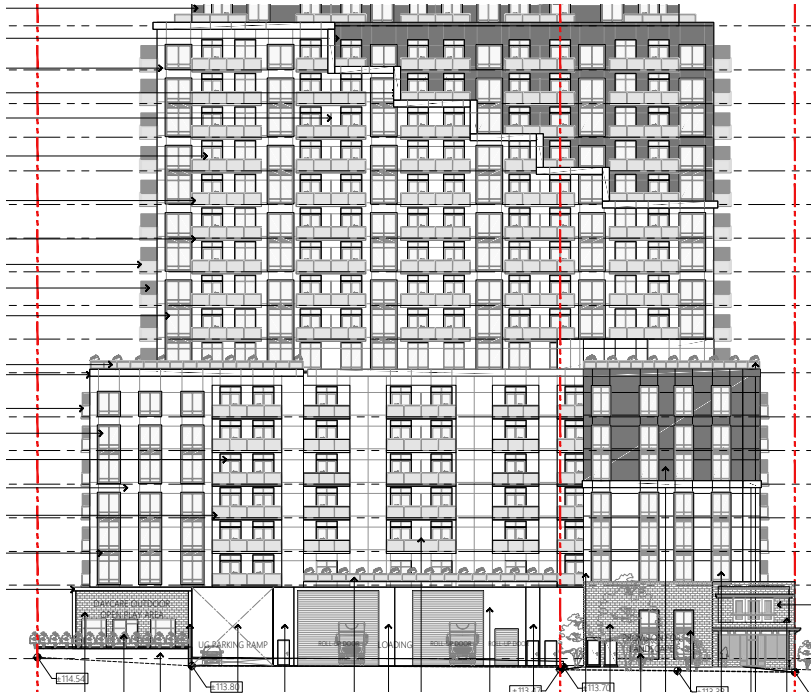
Excerpt of proposed south elevation (RA Lumbao Architects, 2025).
